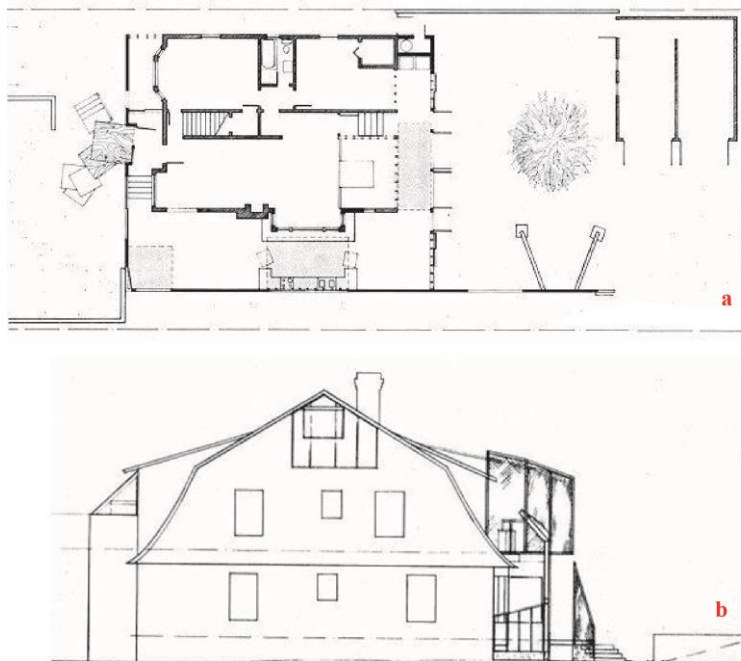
Gehry Residence, a) plan, b) section (Source: <https://www.archdaily.com/67321/gehry-residence-frank-gehry> . Retrieved at: 03.01.2017)
